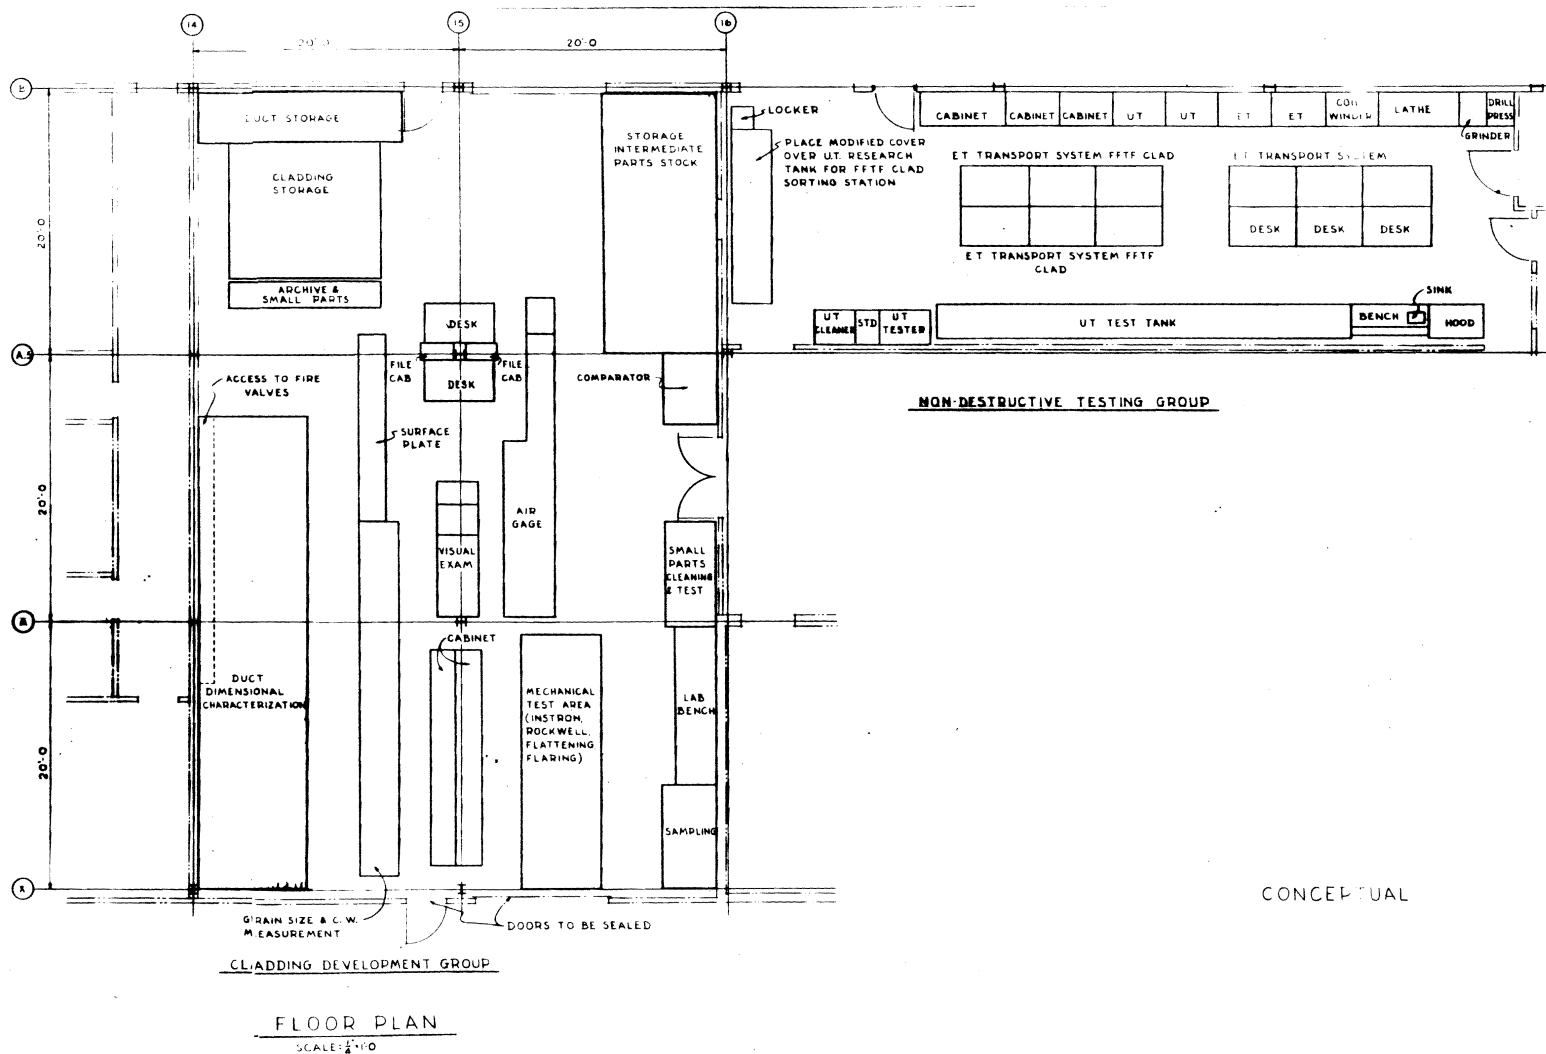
Conceptual Layout of Cladding Receiving, Inspection and Storage Facility
